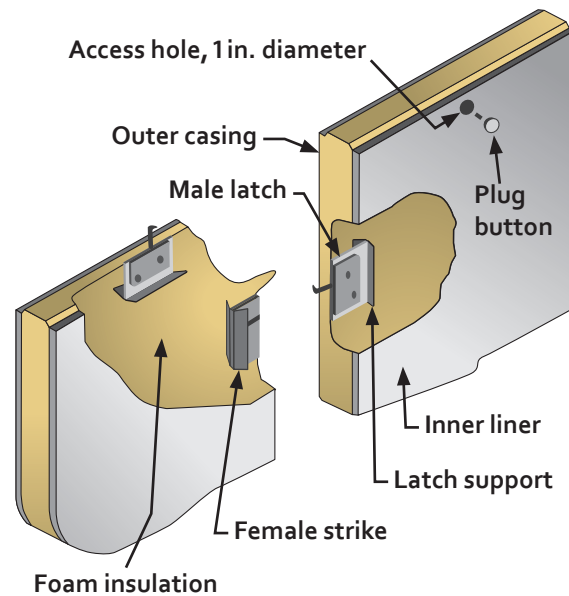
Prefabricated cooler panel latching mechanism. (Polar Bear® box)
